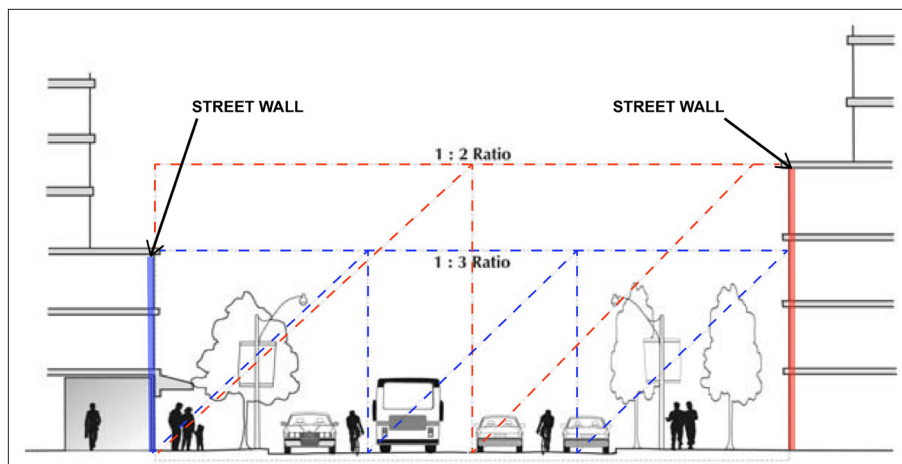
A building height-to-street-width ratio of between approximately 1:3 and 1:2 is recommended to frame streets and provide human scale. Portions of buildings above the street wall are encouraged to step back.
